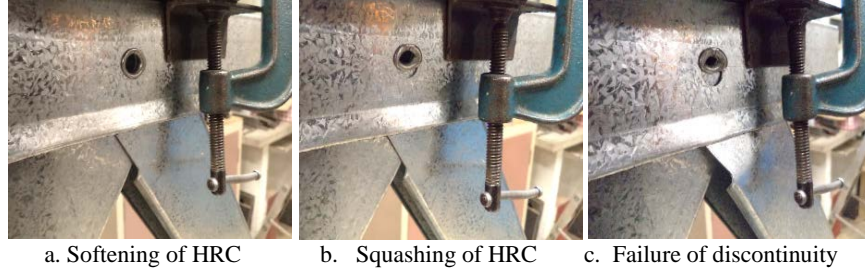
Failure modes of truss panel specimens without bolt at discontinuity
